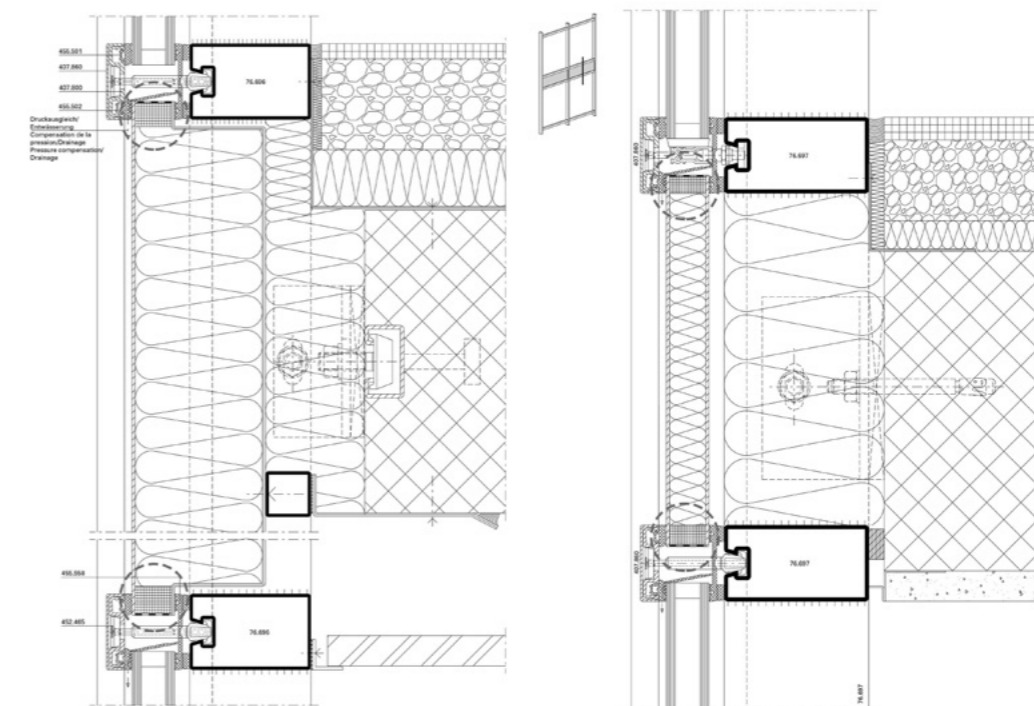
Jansen VISS façade section (Source: ODS NL, 2021)
